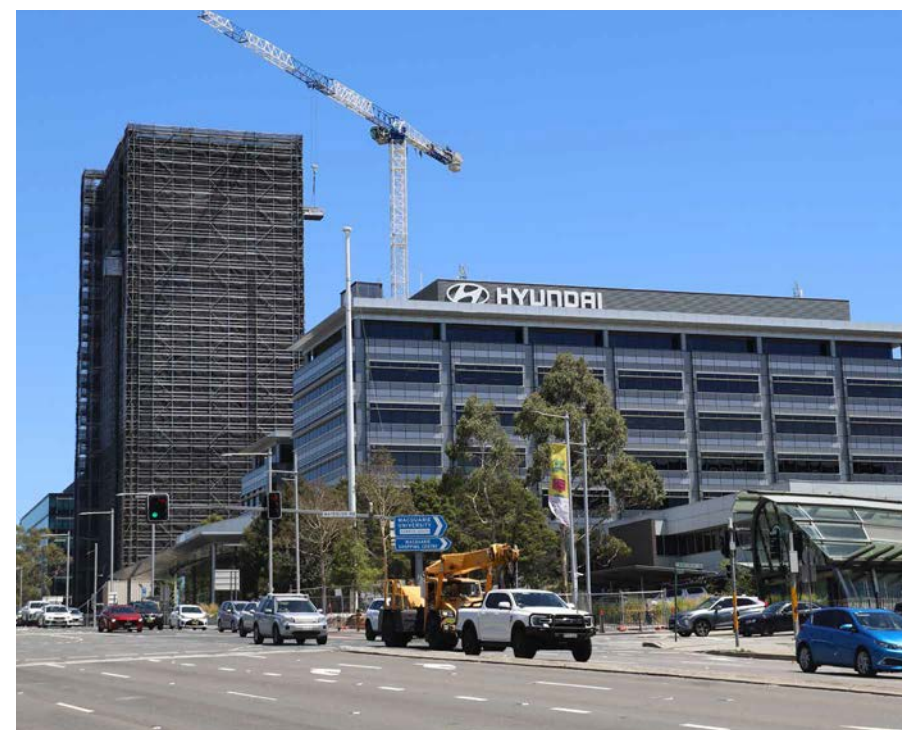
South-west view from the intersection of Waterloo Road and Lane Cove Road.
